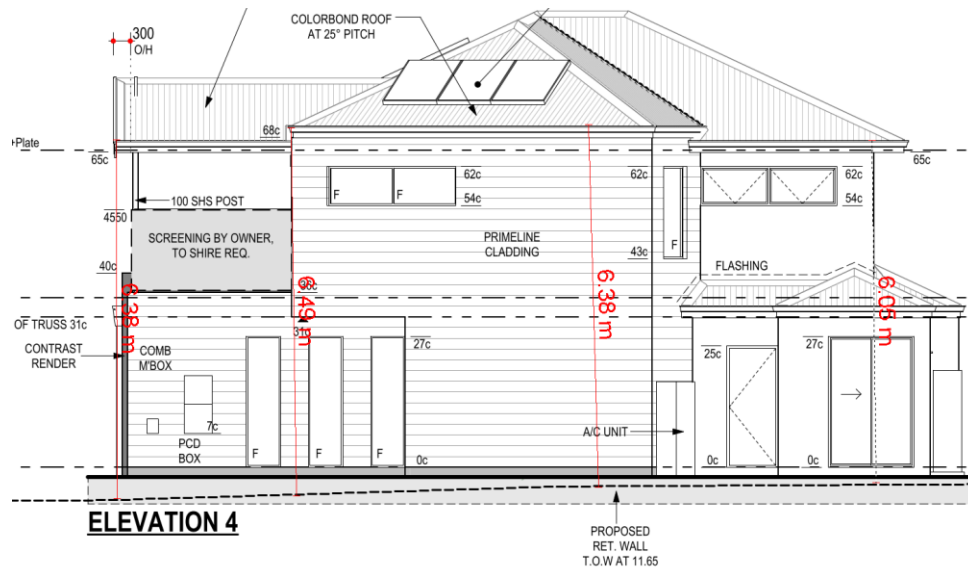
Elevation of proposed dwelling illustrating areas exceeding the building height requirement
